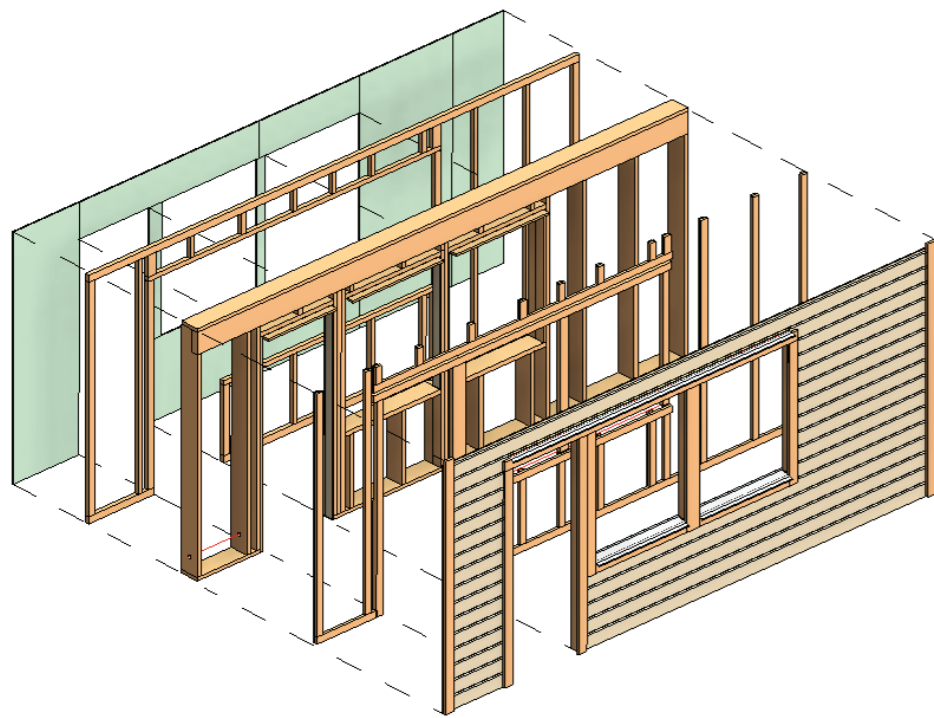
A wooden wall element in an exploded view without doors, windows, wind barrier, insulation, vapour barrier and electrical installations.
